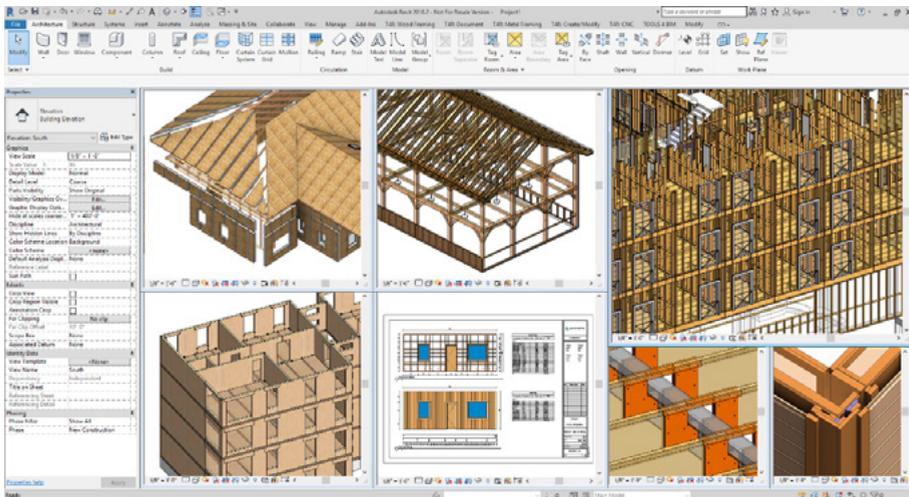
Wood constructions in BIM (Agacad, 2020).
